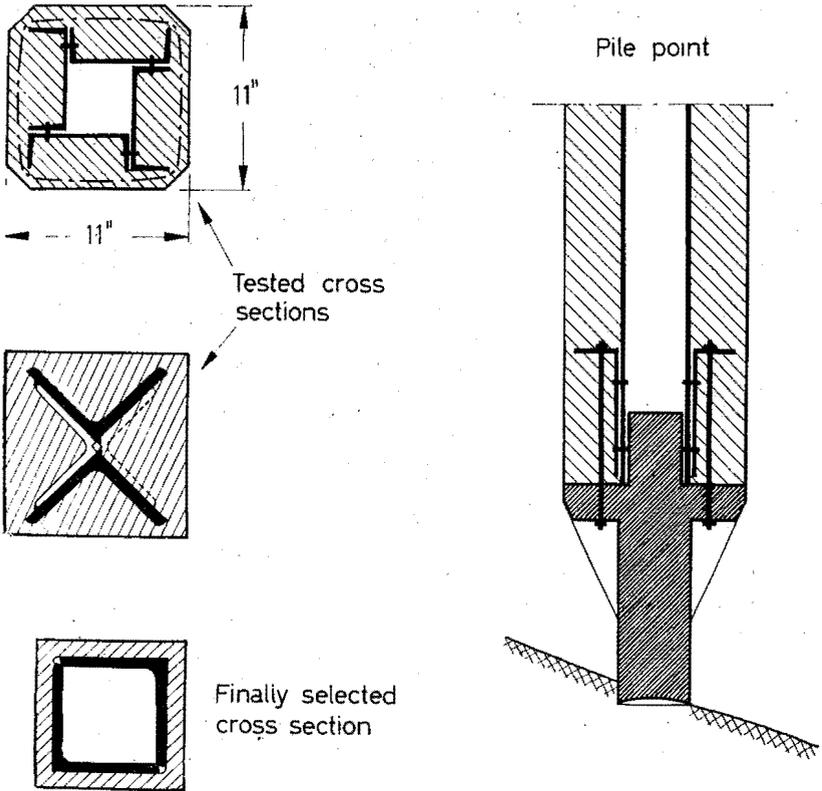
CROSS SECTIONS OF STEEL PILES AND PILE POINT USED FOR FOLKETEATERET OSLO 1931. (FOLKESTAD 1934).
